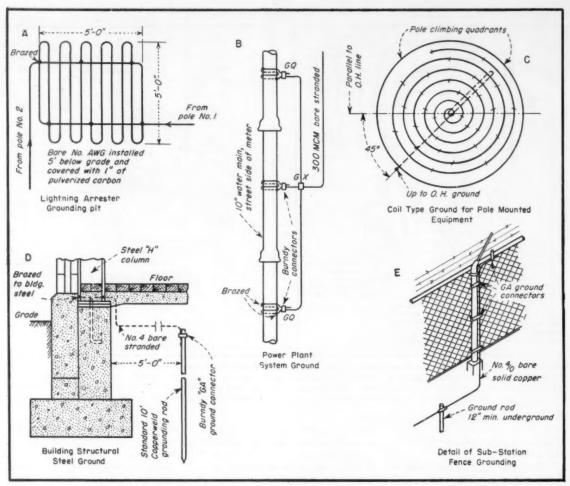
Grounding media include (a) a carbon-blanketed copper mat for lightning protection, (b) a 3-point bridle yoke brazed to the water main as a ground for the power system, (c) buried coils for pole-mounted equipment, (d) driven Copperweld rods connected to structural columns via bare stranded cable and (e) a variety of clamping devices.
